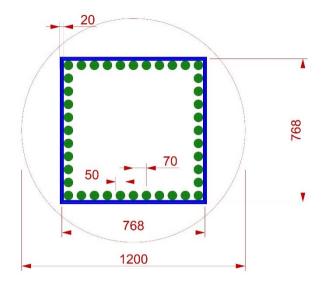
Cross-section of the pile with reinforcement. Units in mm.
